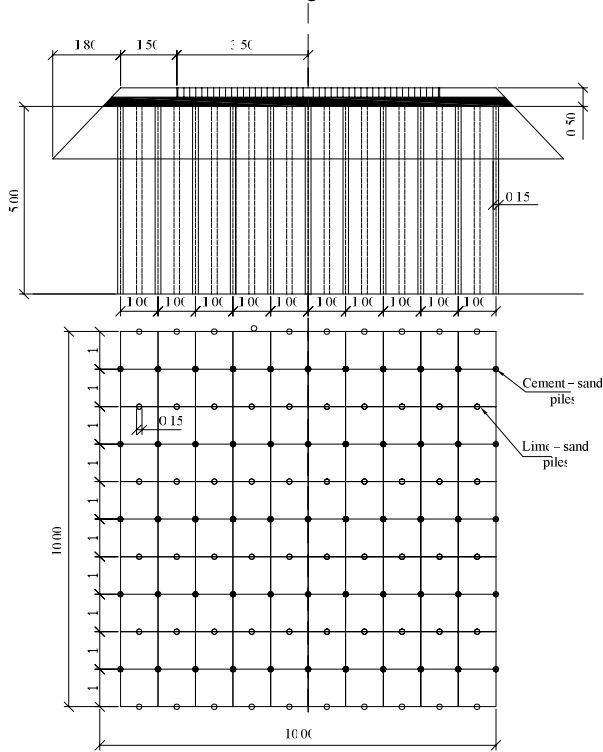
Proposed solution – cross section through embankment and treated soil foundation
